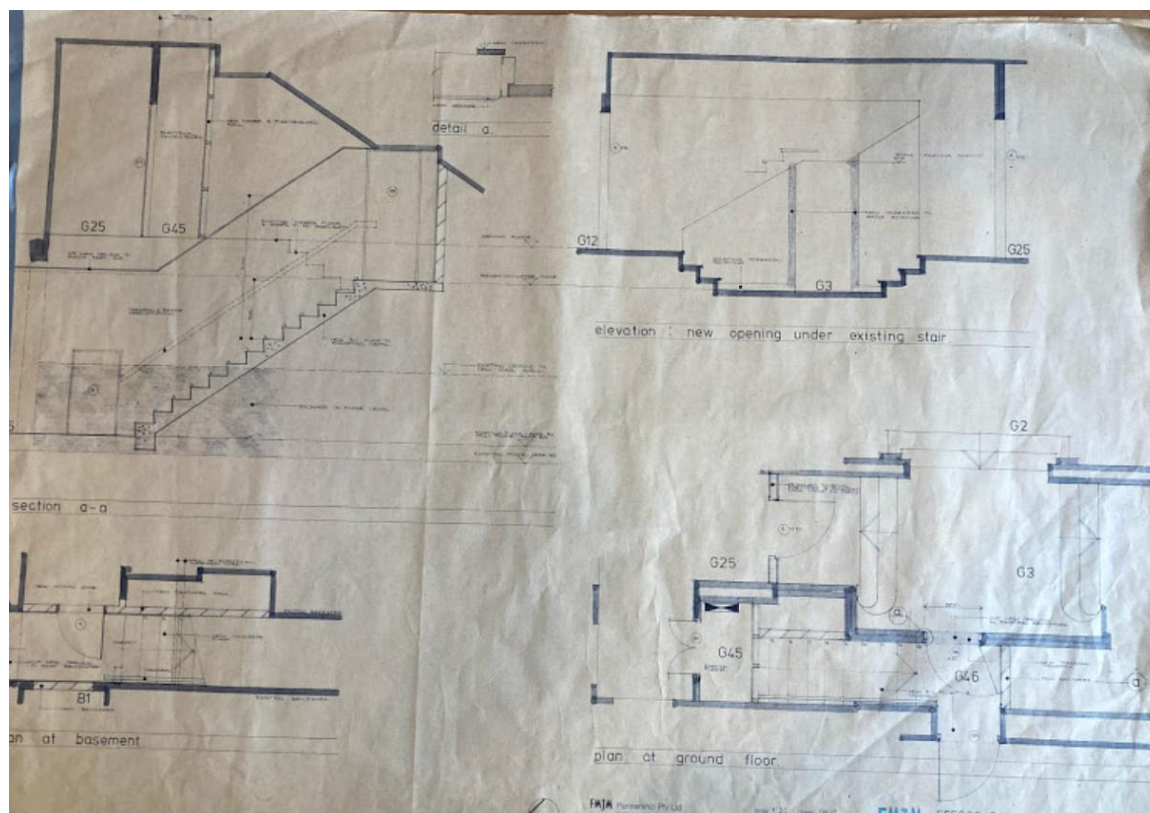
Plan for new basement stairs in Wilkinson House, 1984
